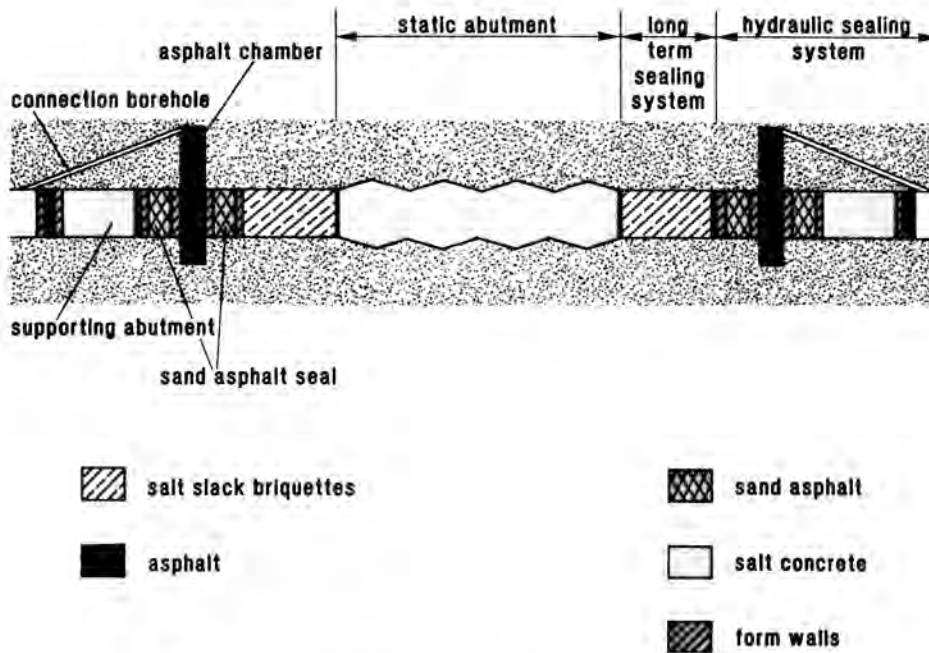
Diagrammatic Sketch of Dam Construction (Vertical Section).
